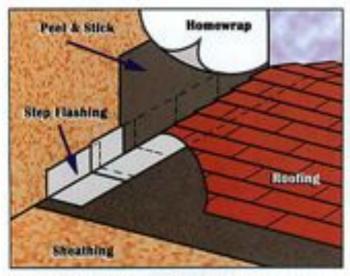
Peel-and-stick flashing from sheathing onto metal flashing.
